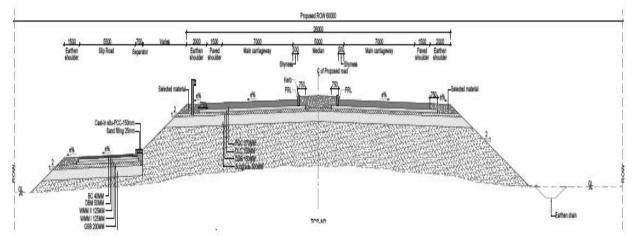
TCS-N2 Typical Four Lane Underpass Cross Section with Slip Roads in Bypass & Realignment
